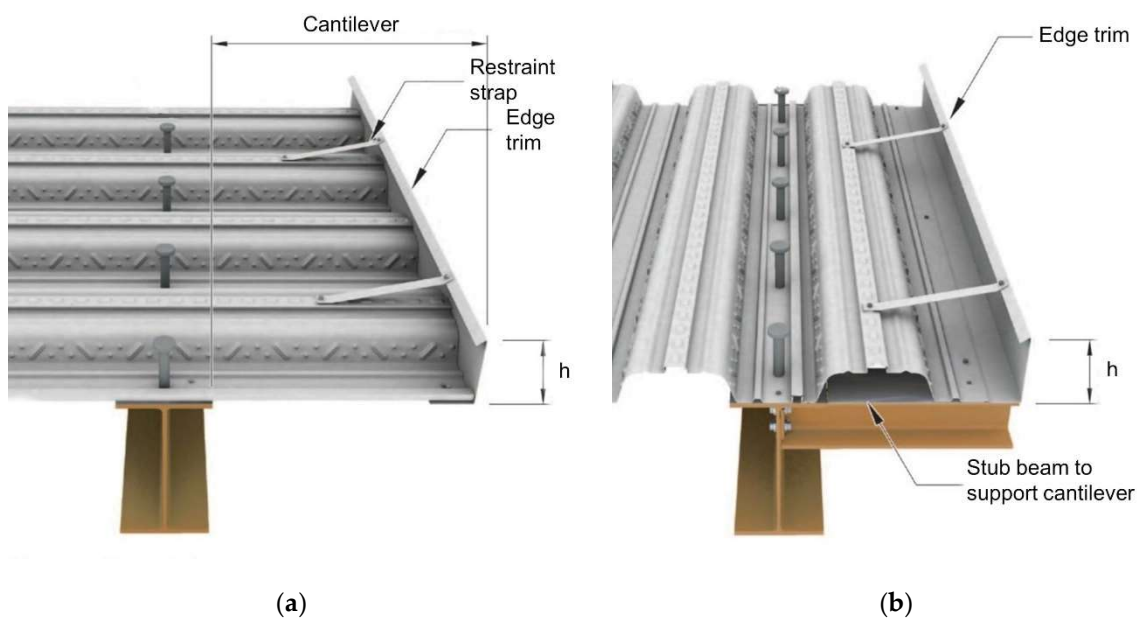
Typical edge configurations with cantilever: (a) perpendicular orientation of the steel decking (b) parallel orientation of the steel decking [63]
